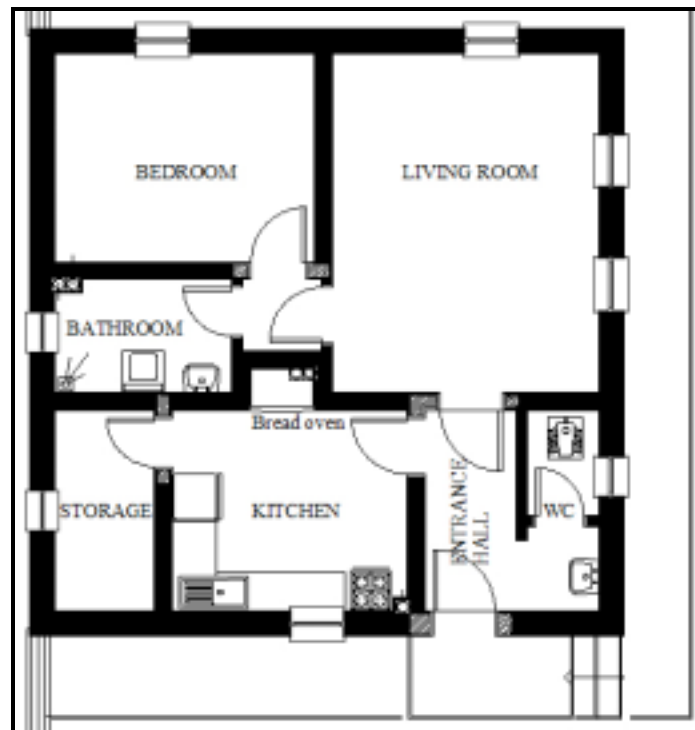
Original Plan of the PDH with *Typical Design* - Type 3 (75.68 m²)
